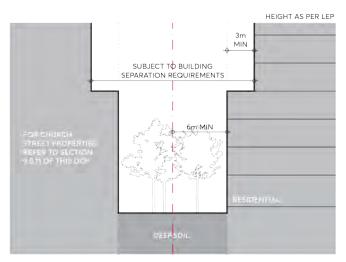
Setbacks and separation with properties fronting Church Street (site 05, site 06, site 09, and site 10)
